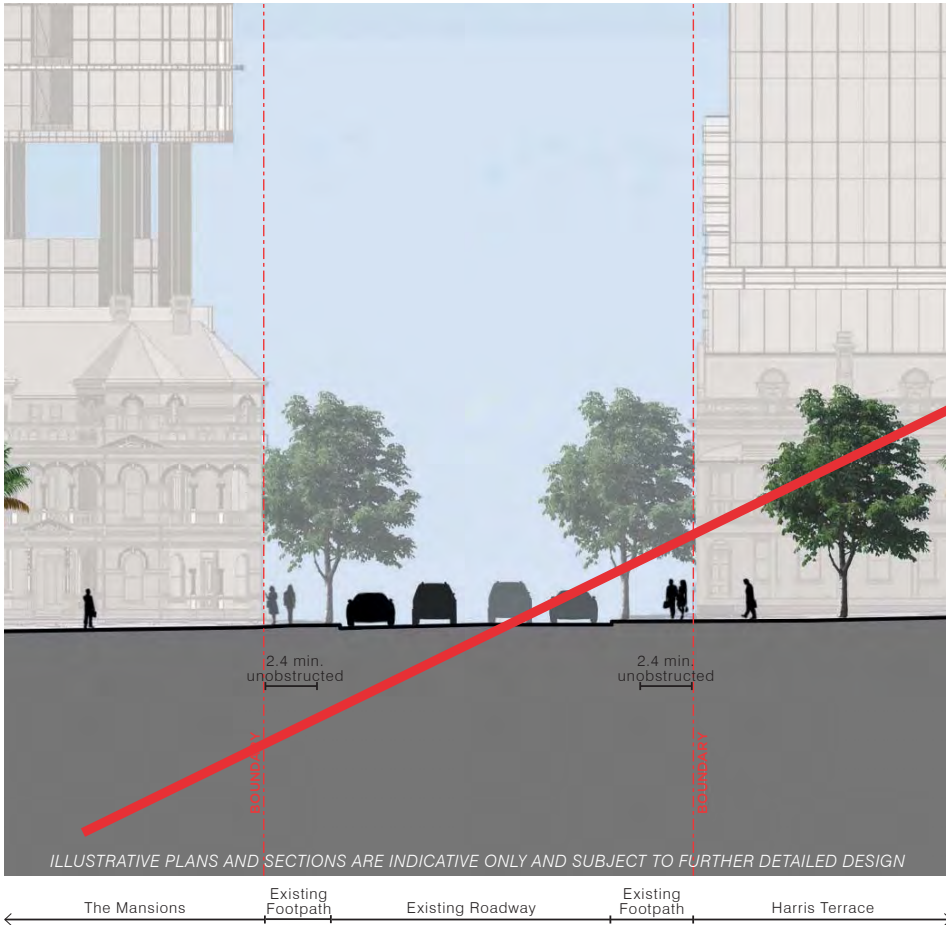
Margaret Street sectional elevation at The Mansions and Harris terrace
